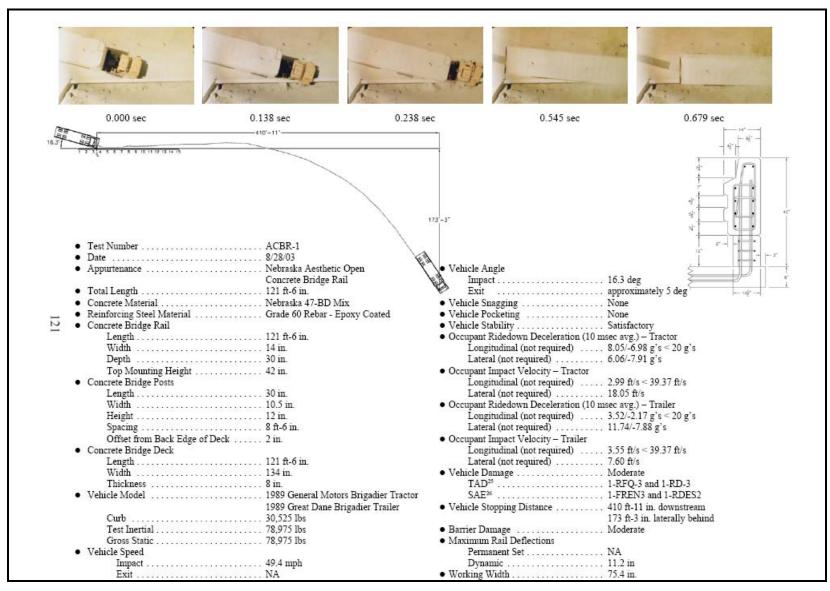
NDOR Aesthetic Open Concrete Bridge Rail
